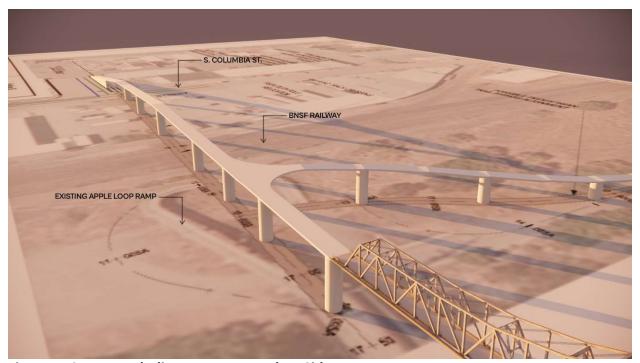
Conceptual Alignment, Wenatchee Side Credit: Exeltech Consulting, Inc.
